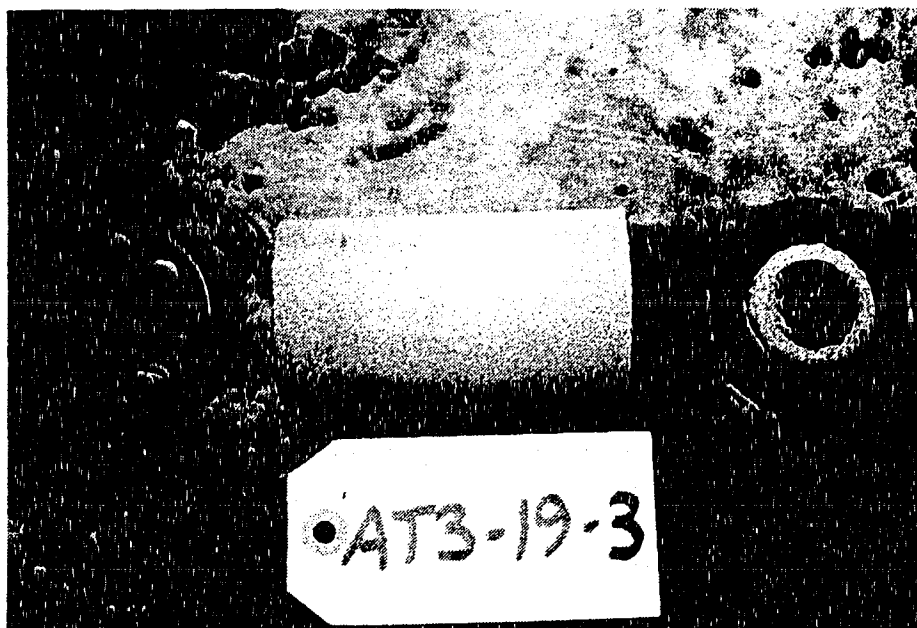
Lathed core sample AT3-19-3 and end pieces
